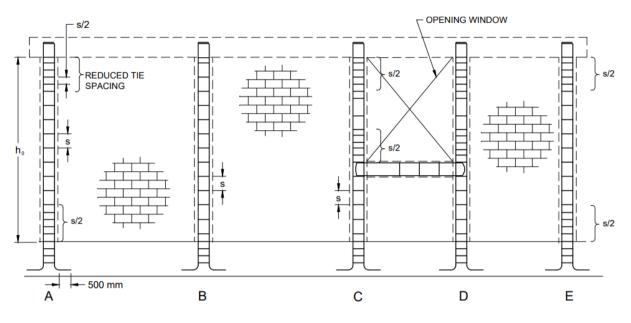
TIE-COLUMN TRANSVERSE REINFORCEMENT REQUIREMENTS FOR EARTHQUAKE ZONES IV, V AND VI
